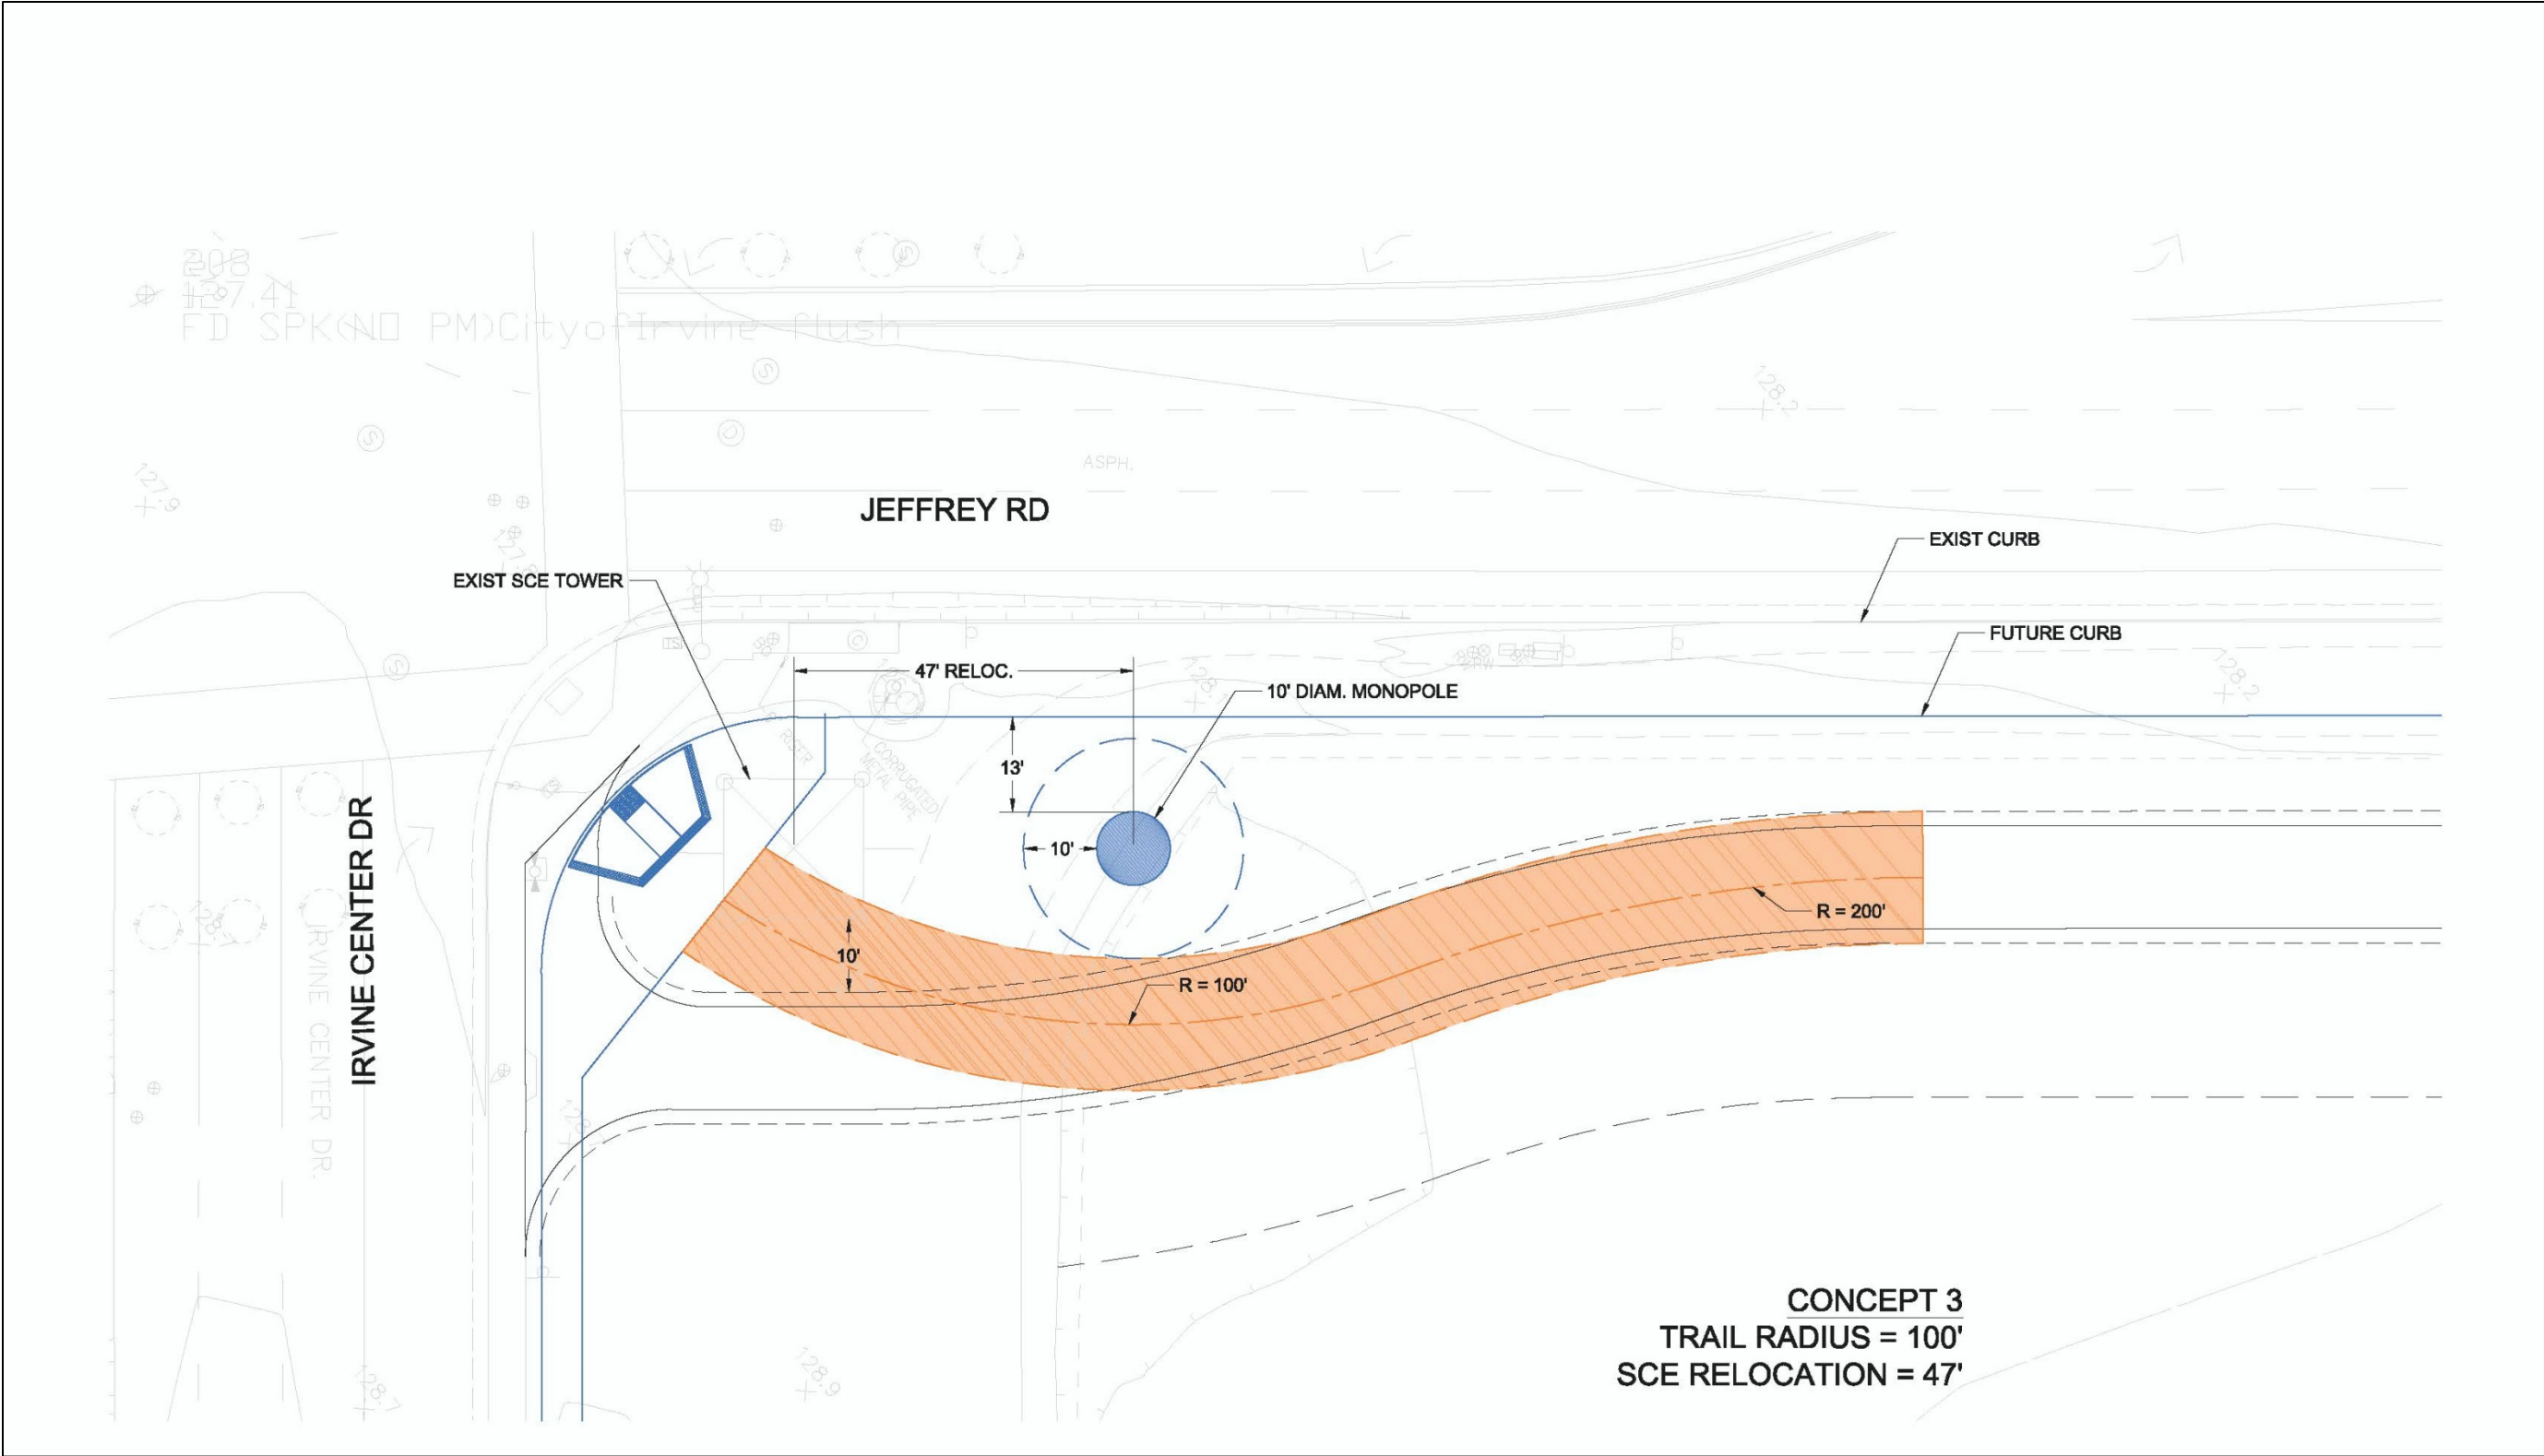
Proposed conceptual plan for removal and replacement of SCE 66 kV Santiago-Estrella No. 1 transmission tower with monopole
